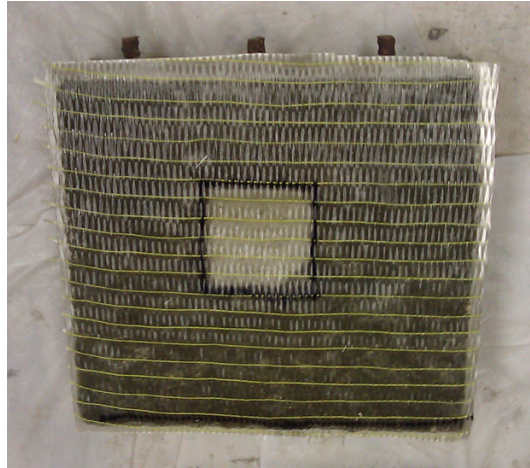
FRPP2, FRP-bonded reinforced concrete panel
